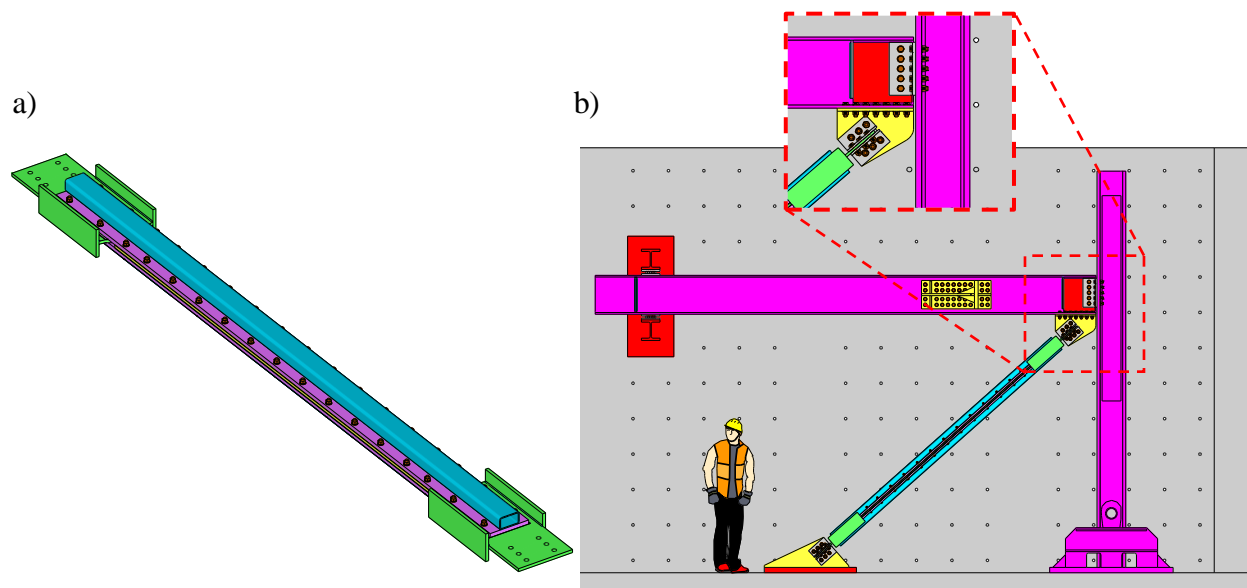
a) 3D view of an assembled BRB specimen, b) loading frame with installed BRB specimen.
